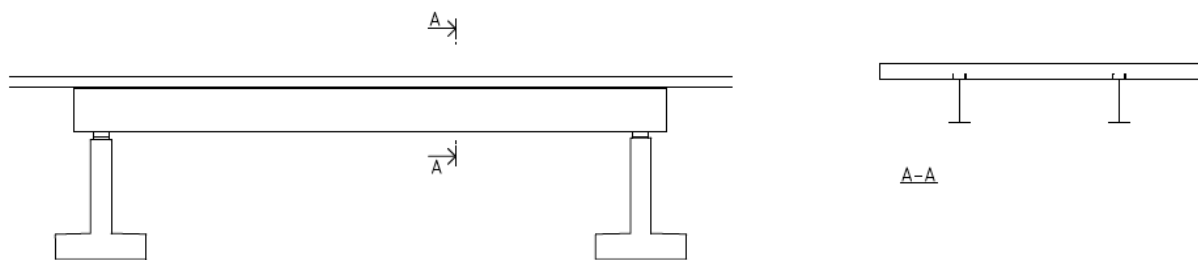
Schematic figure of a steel bridge with concrete deck
